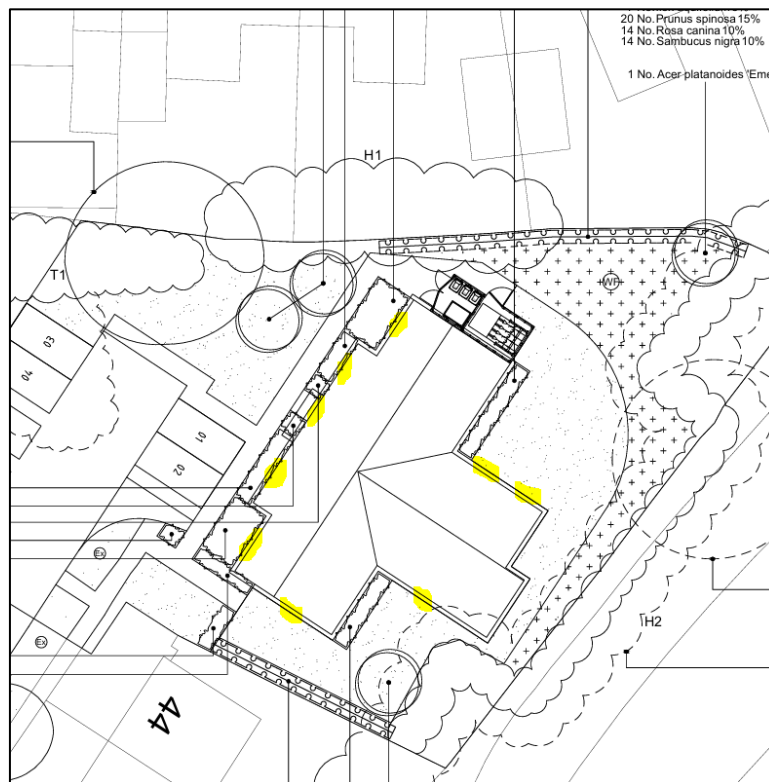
PROPOSED LANDSCAPING PLAN WITH LOCATION OF FIRST-FLOOR WINDOWS HIGHLIGHTED
